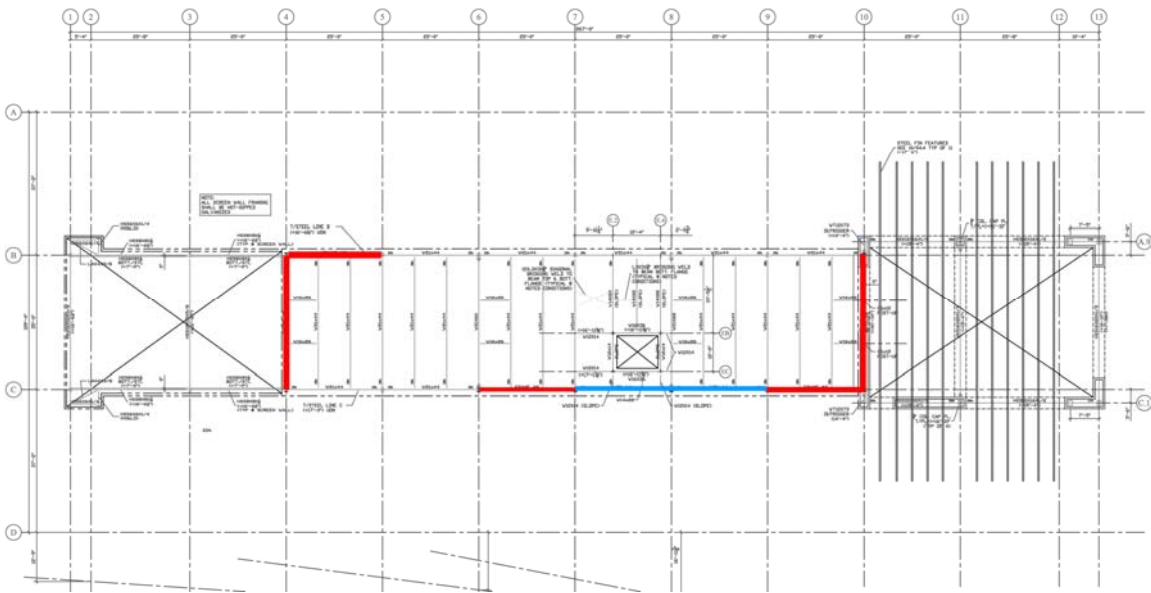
6<sup>th</sup> Floor plan with highlighted frames
